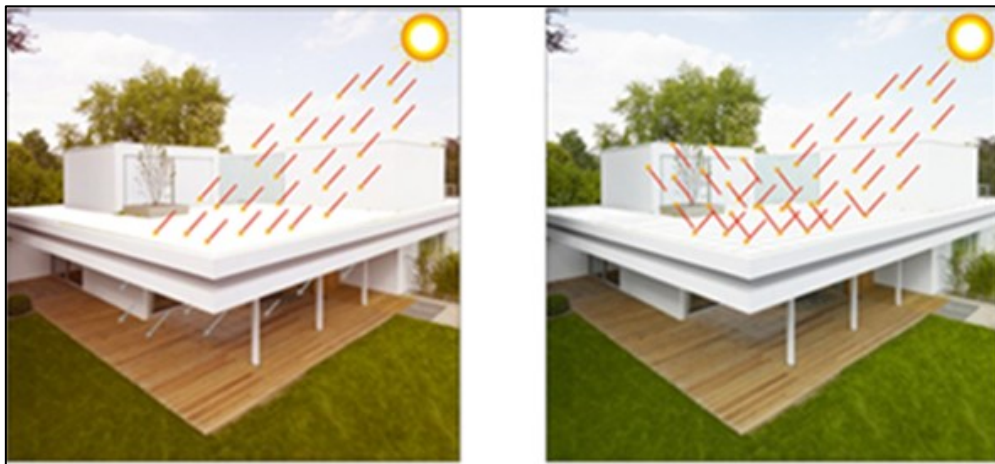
Difference Between Normal Roof & Cool Tiled Roof
